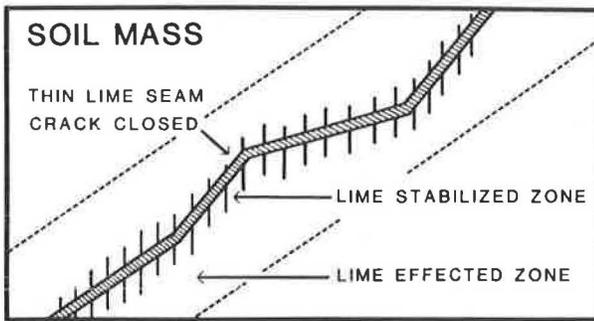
Soil crack after stabilization with lime slurry pressure injection.
